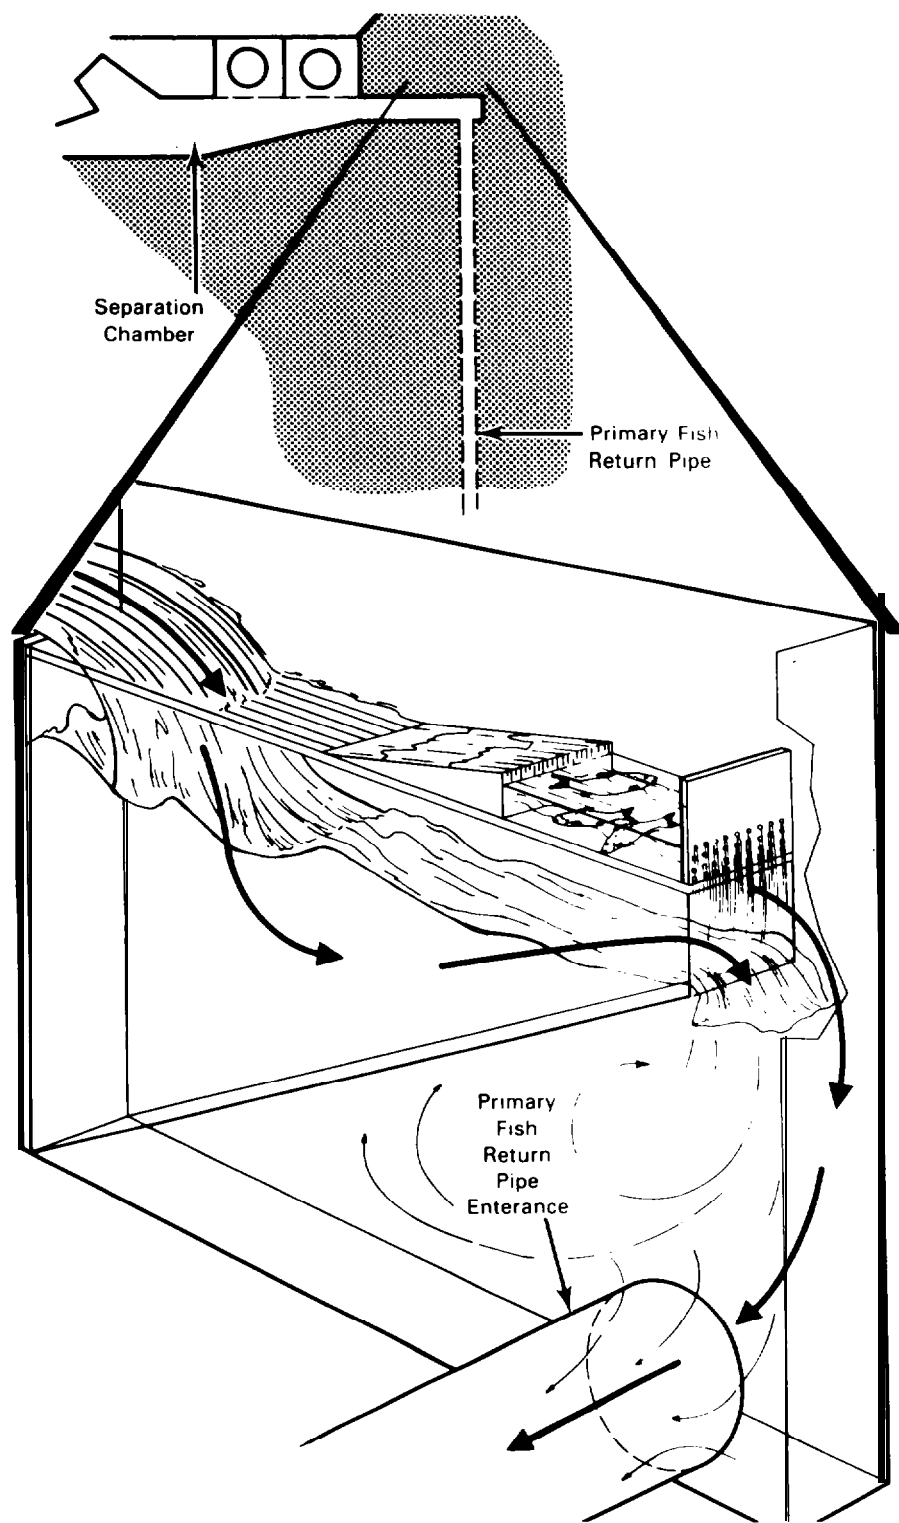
Inclined Plane System Used at the Sunnyside Canal Fish Screening Facility, Spring 1985
